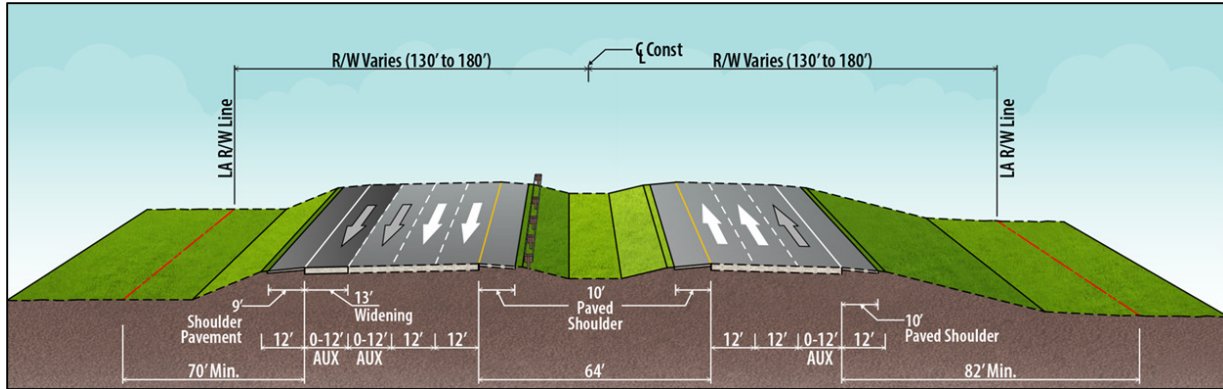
I-275 Mainline Build Alternative Typical Section from south of 54th Avenue I-175 (Segment A)
